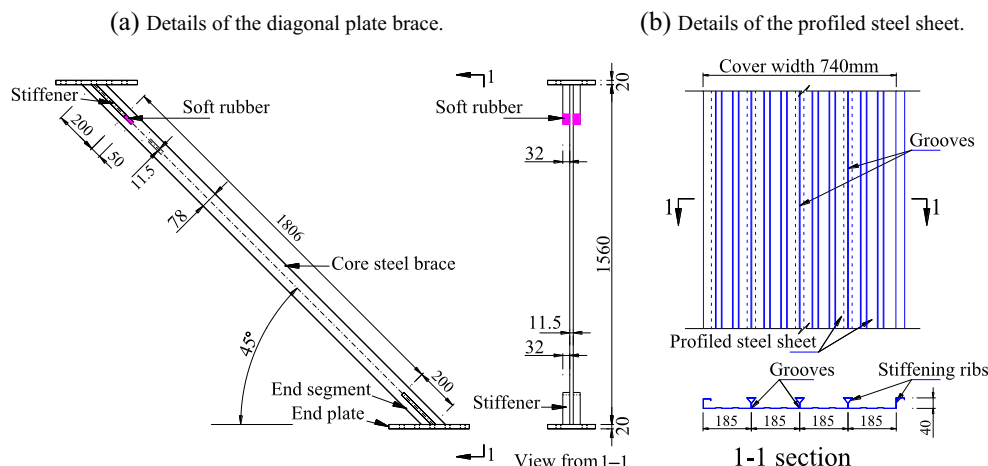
Details of the plate brace and the profiled steel sheet for the CPBRB specimens (unit: mm). (a) Details of the diagonal plate brace. (b) Details of the profiled steel sheet.
